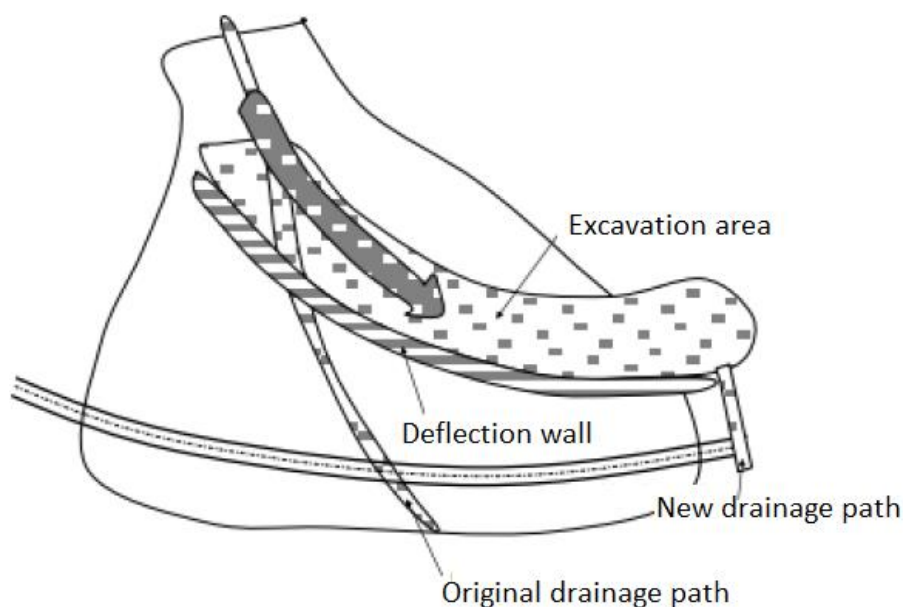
Deflection wall to secure road (Norem & Sandersen, 2012, p. 77)
